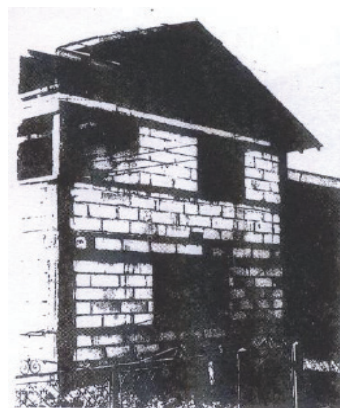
City type rural two storied yong blocks dwelling with RC members (RC window beam lintel parallel to the collar beam and floor slab acting as a frame with columns; foundation is made of concrete)
